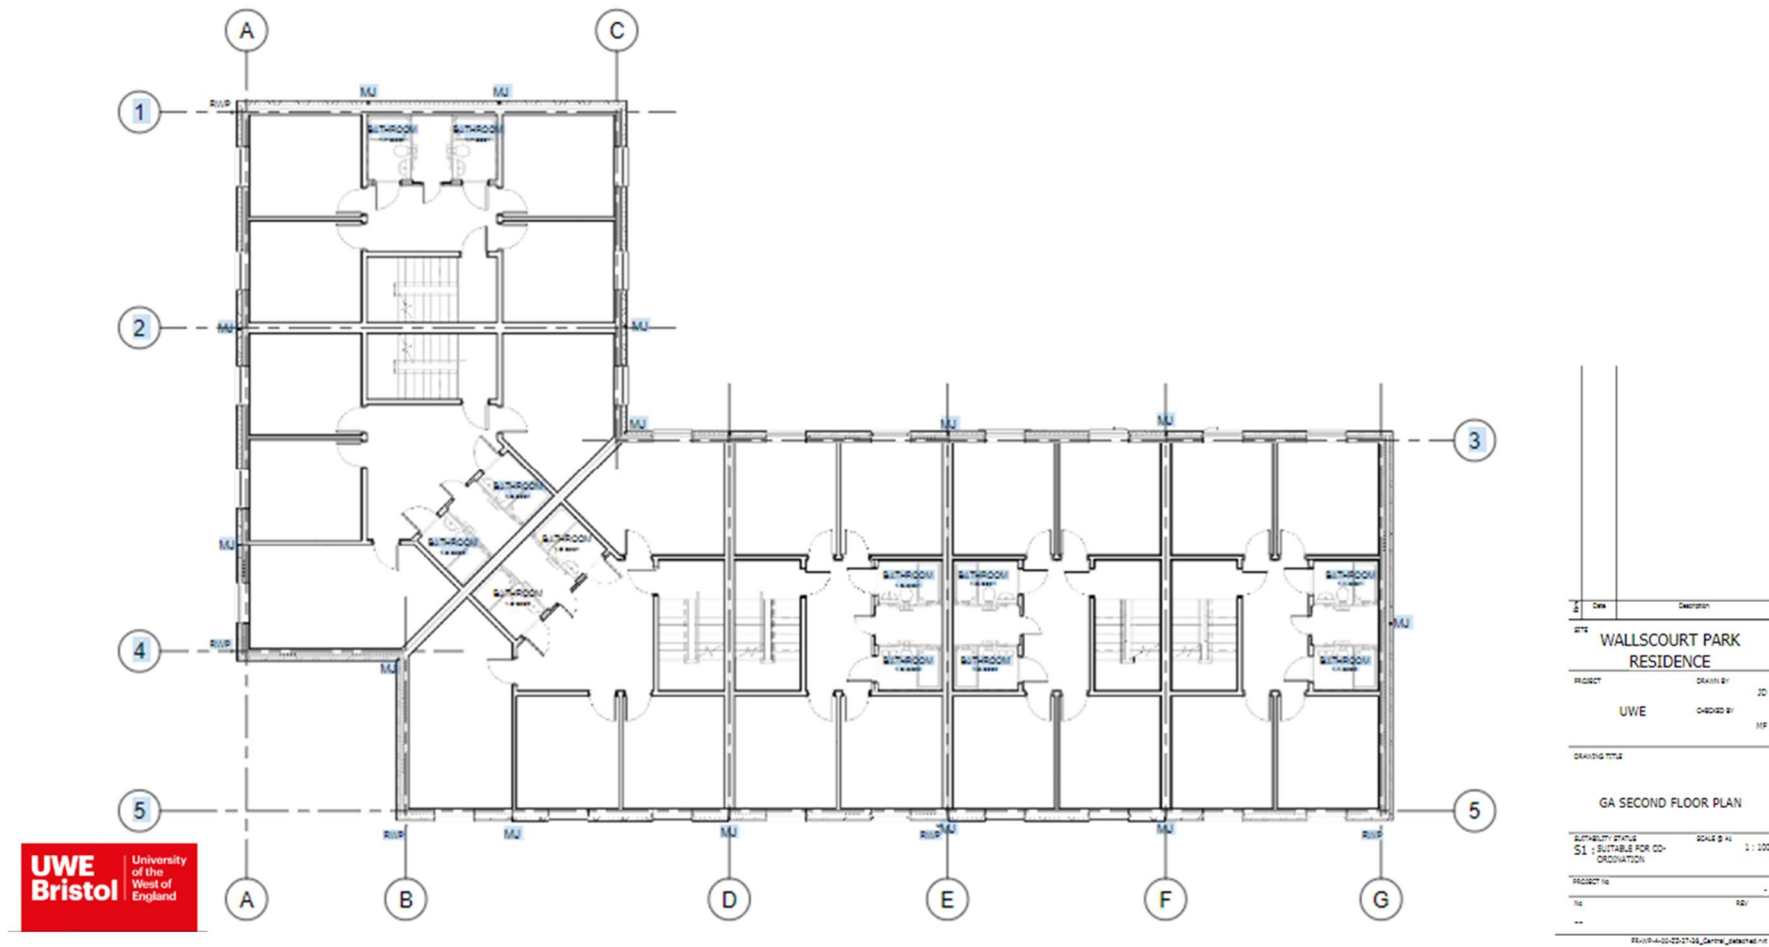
Plan of layout for houses A to F, second floor bedrooms and shower rooms (source: UWE)
